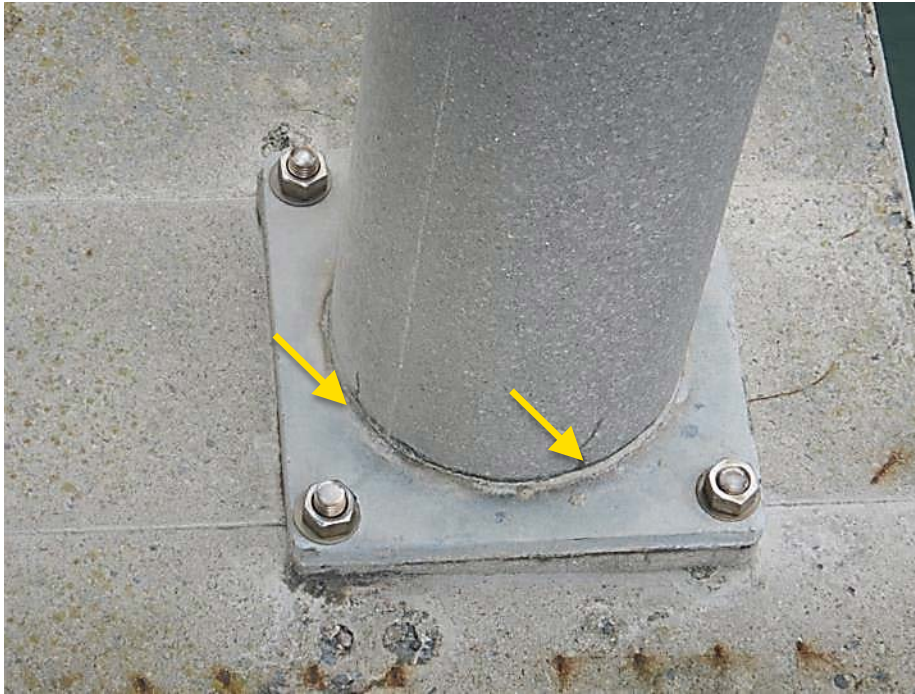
CSB115 Light Pole – Vertical Cracking Near Baseplate (Looking Southwest)
